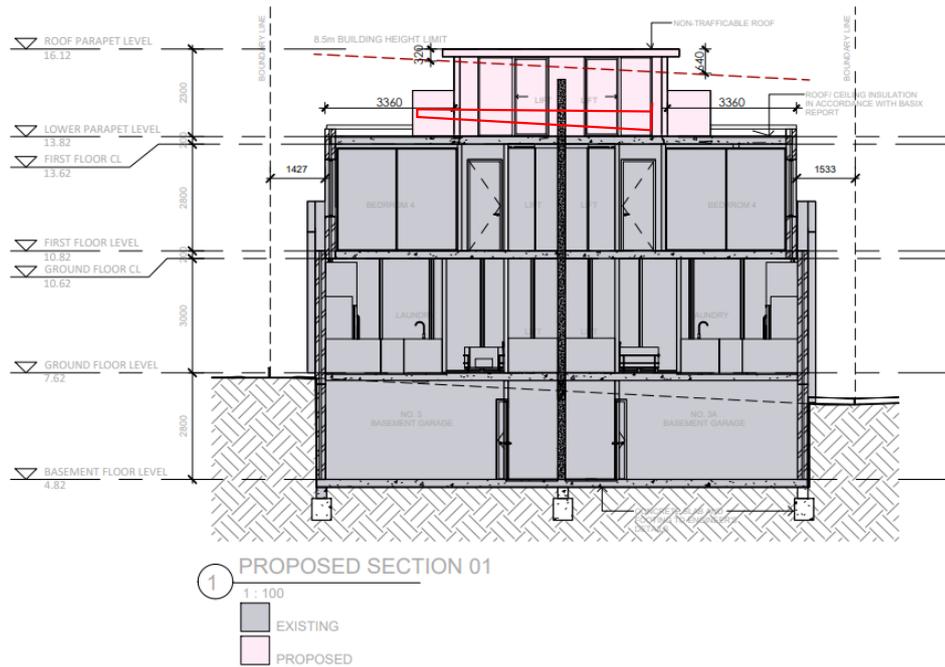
Proposed section plan of new rooftop terrace depicting maximum variation
